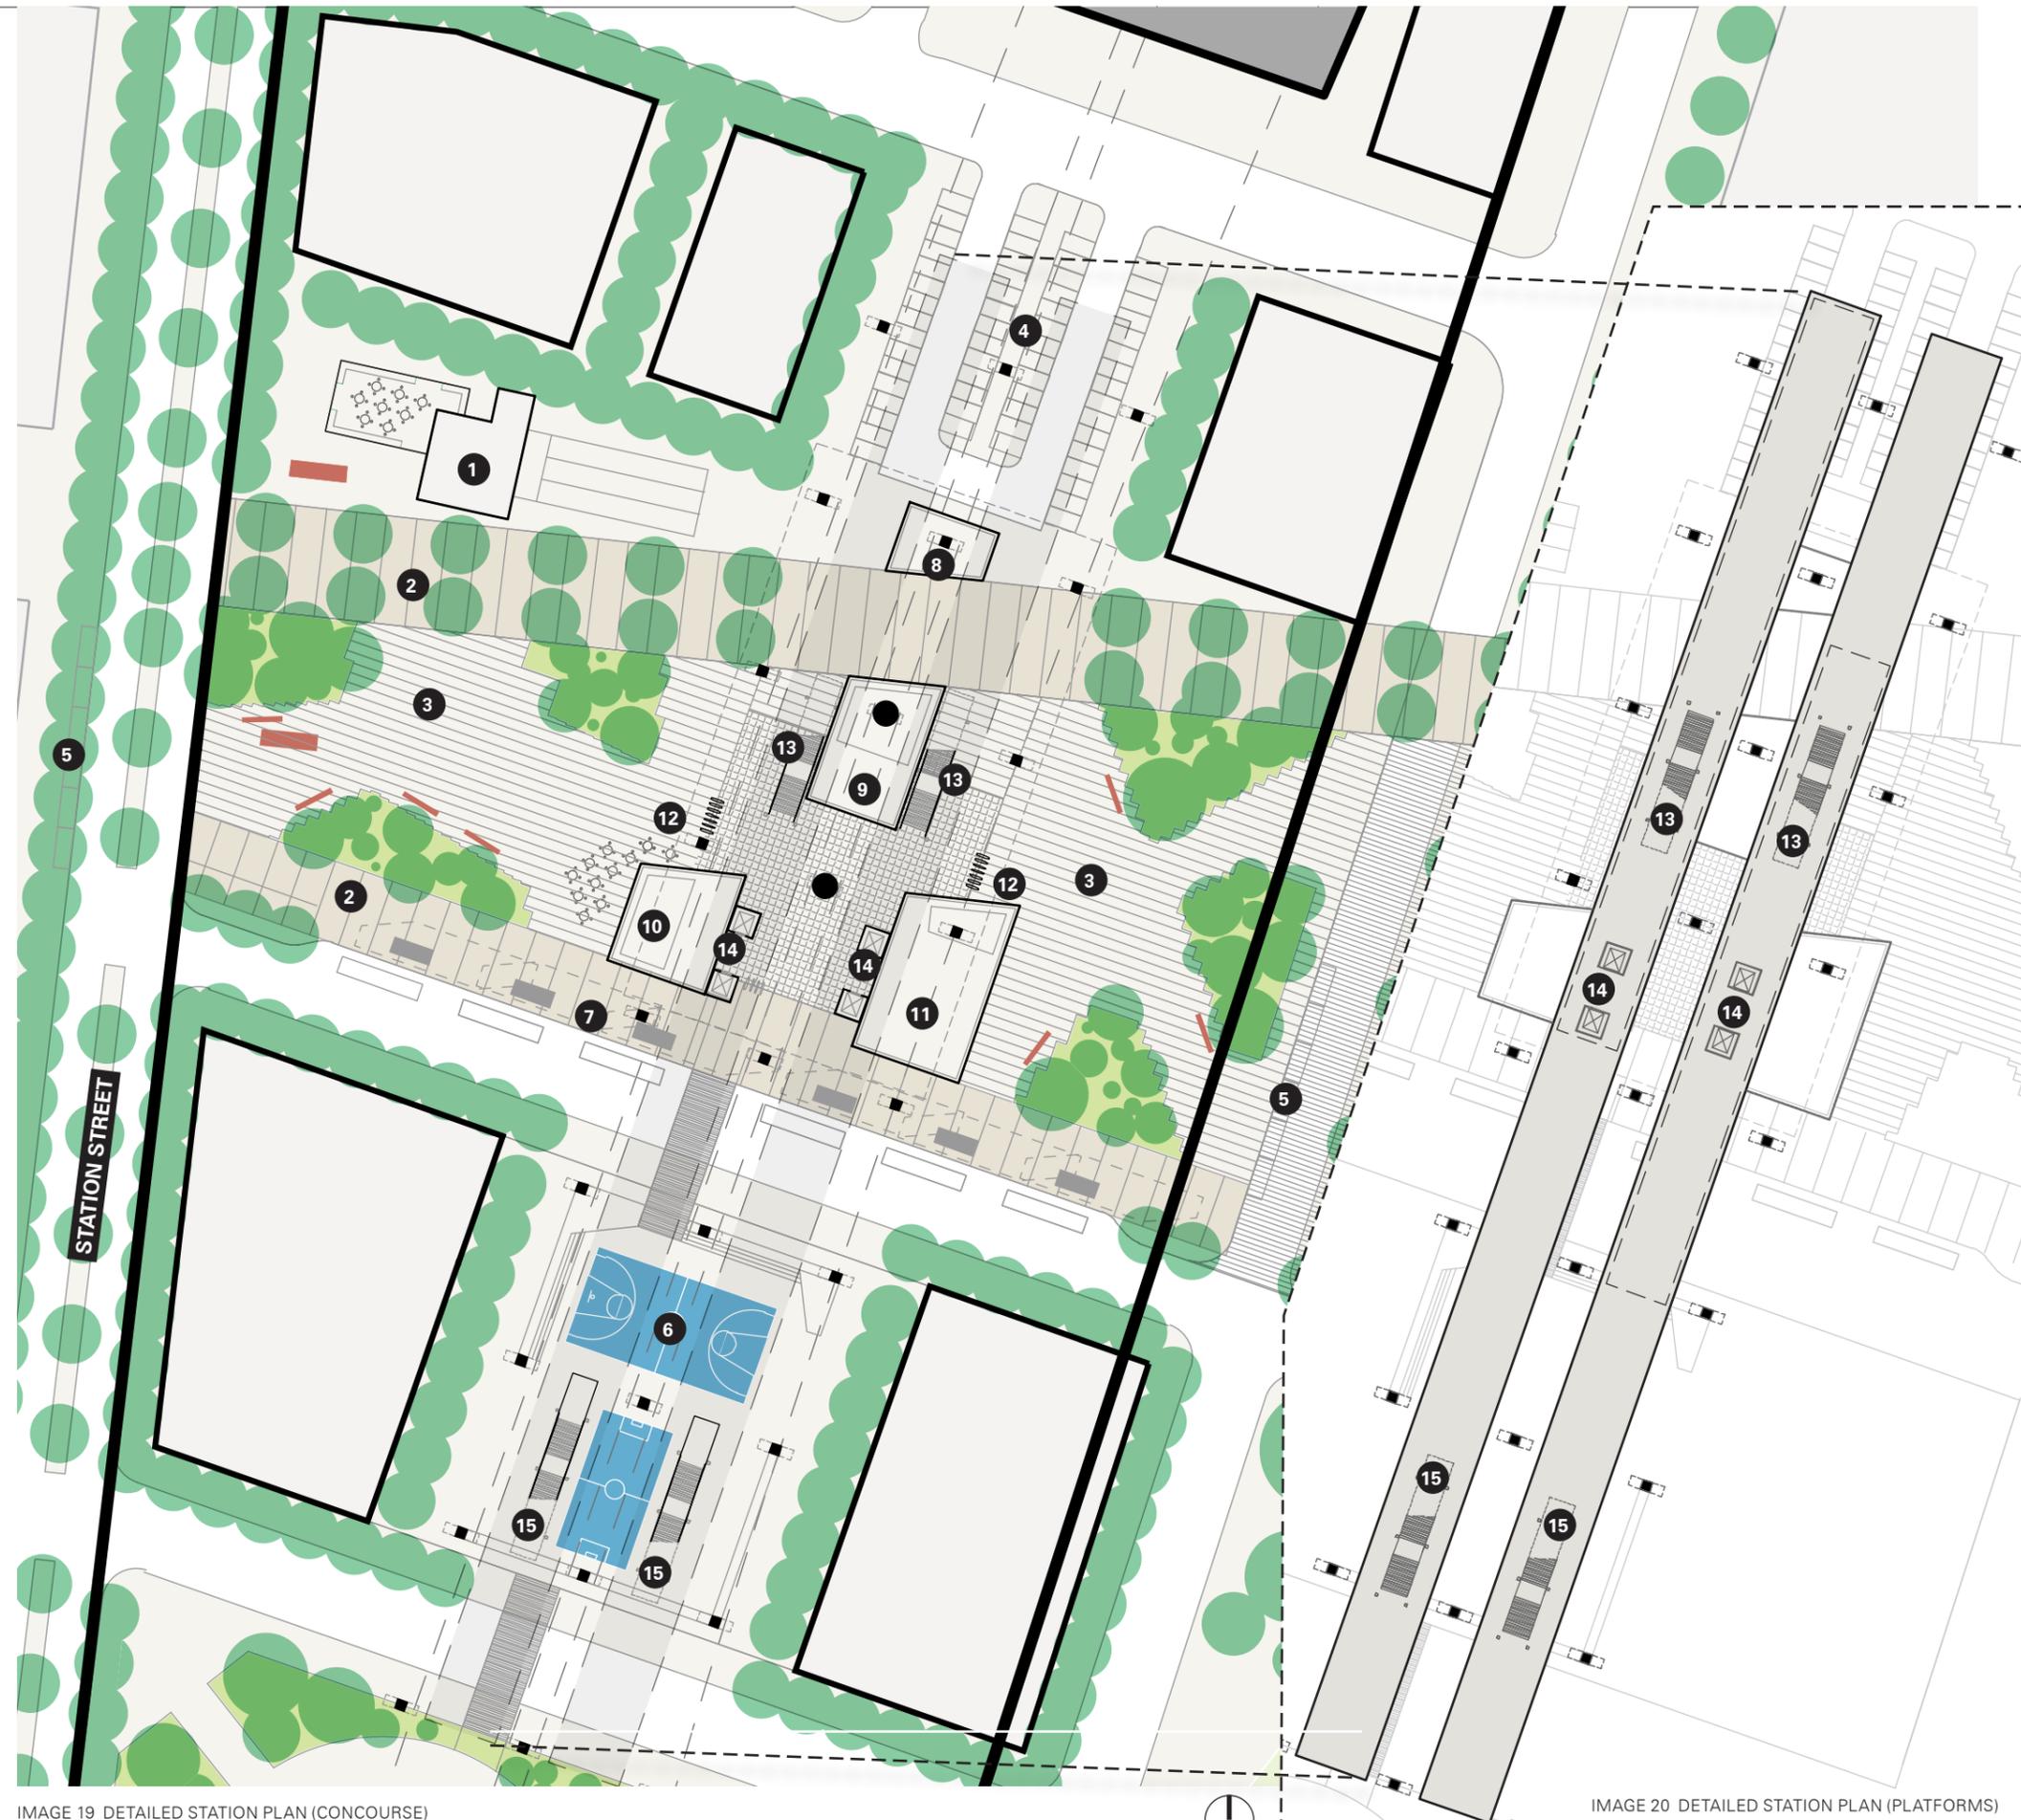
DETAILED STATION PLAN (CONCOURSE)
